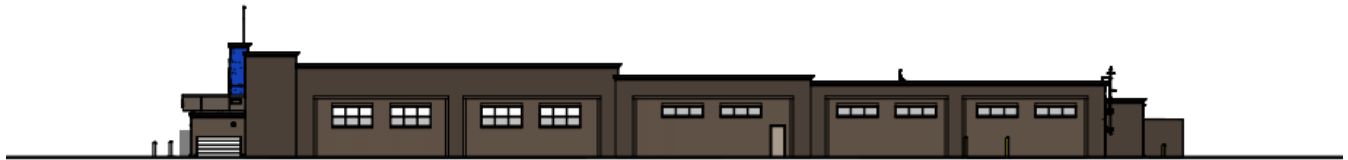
Areas Deficient of Foundation Planting Requirement
